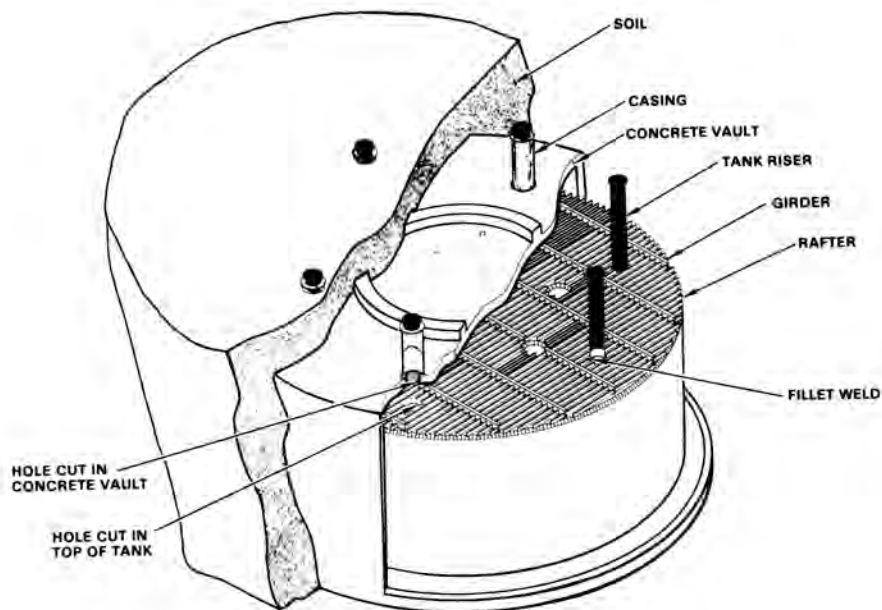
West Valley High Level Waste Tank With New Risers in Place
